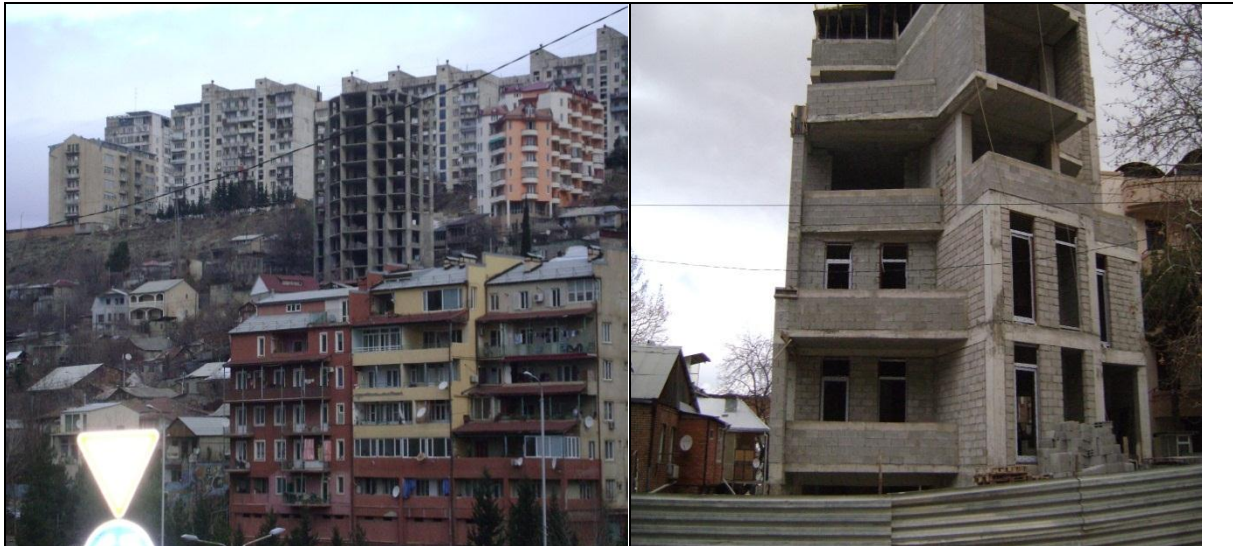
Core and shell construction techniques are commonly used in building construction in the Post-Soviet Era.
